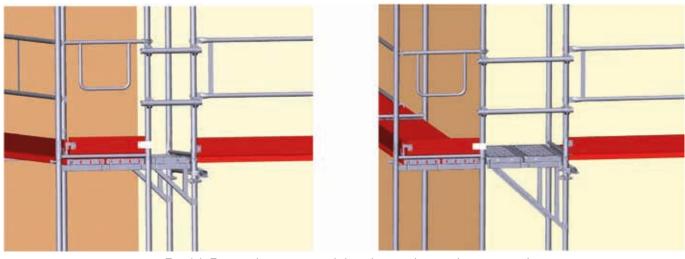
Fitting the corner with brackets, tubes and cross couplings
